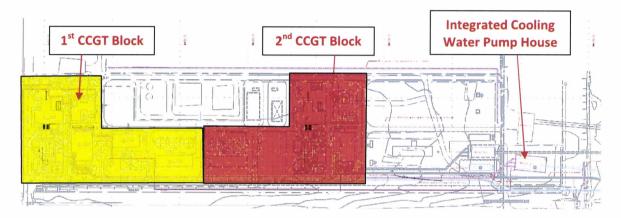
Layout for the 2<sup>nd</sup> CCGT Block
